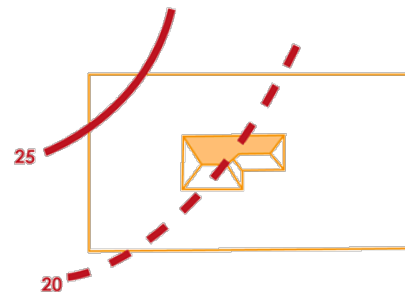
Figure BL: Illustration of Building Site Acceptability based on ANEF Zone
